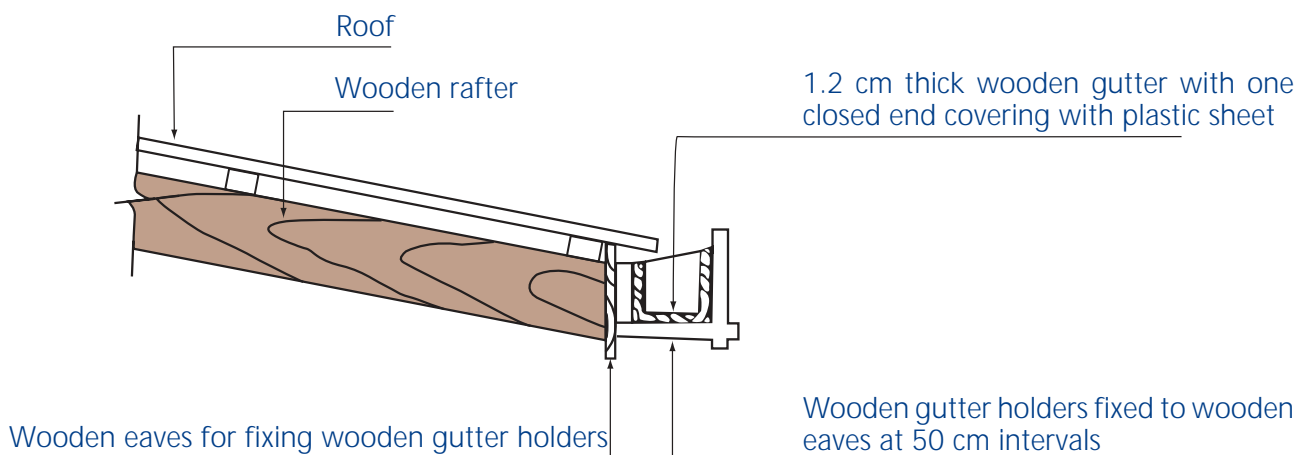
Fix the "U" shape wooden gutter to wooden roof structure.
